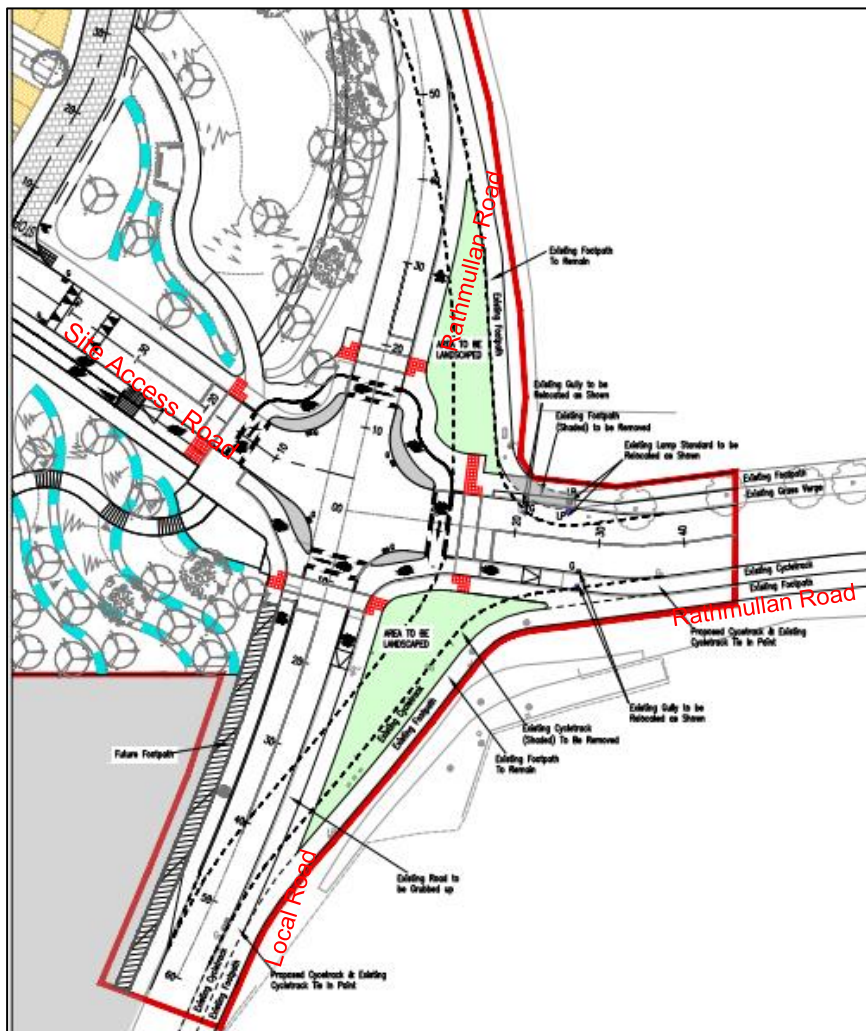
| Proposed Junction 1 (Rathmullan Road / Local Road / Site access road) upgrade
